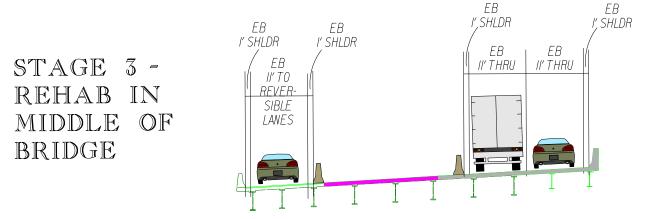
Stage 3 for I-64 EB bridge over Granby St
